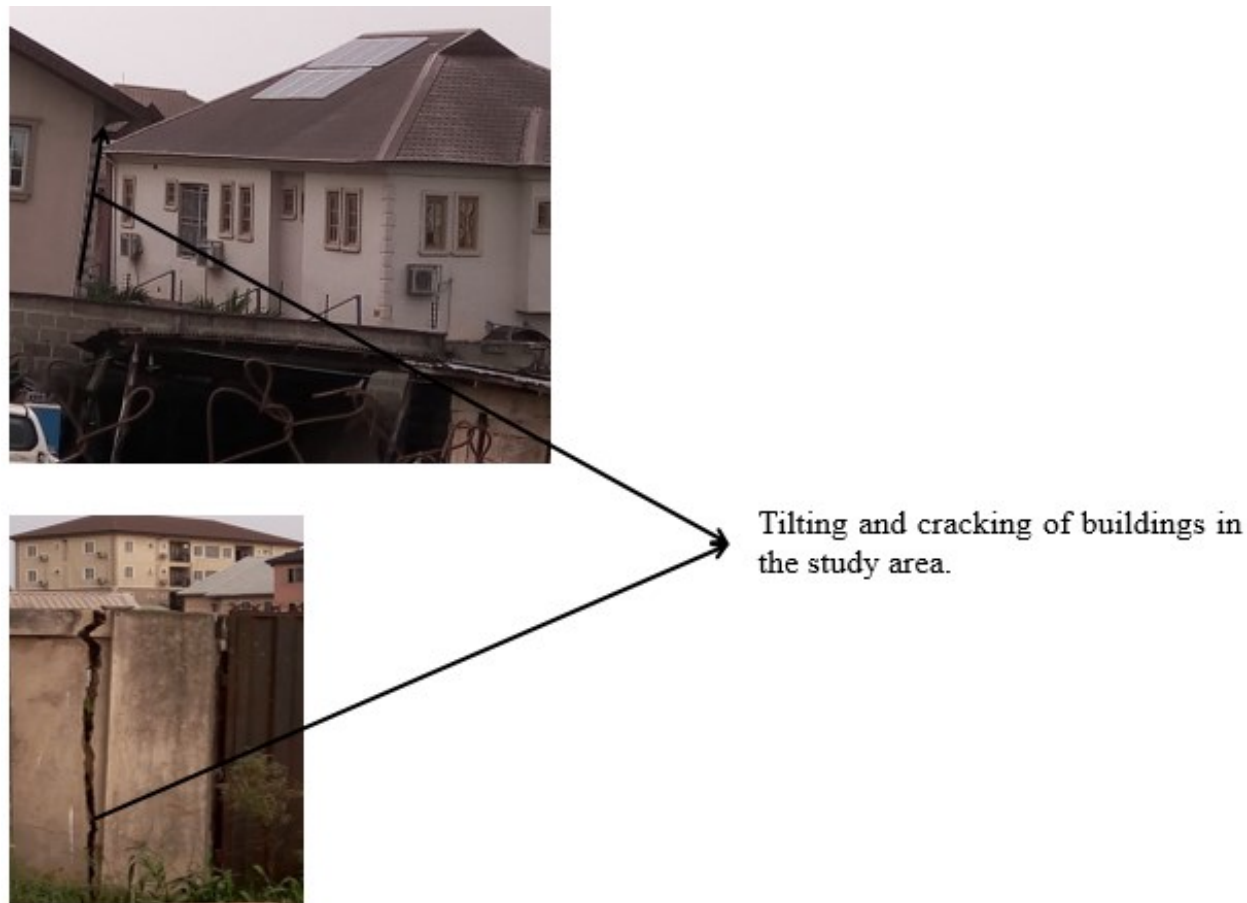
Evidence of Structural Failure of Buildings in the Study Area
